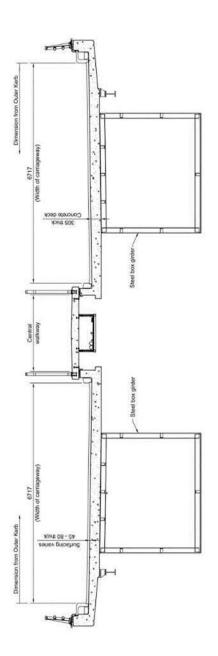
Tay Road Bridge Typical Cross Section (the surfacing varies but will be approximately 45 – 120 m thick and the spans vary between 24.4 m and 76.2 m).
